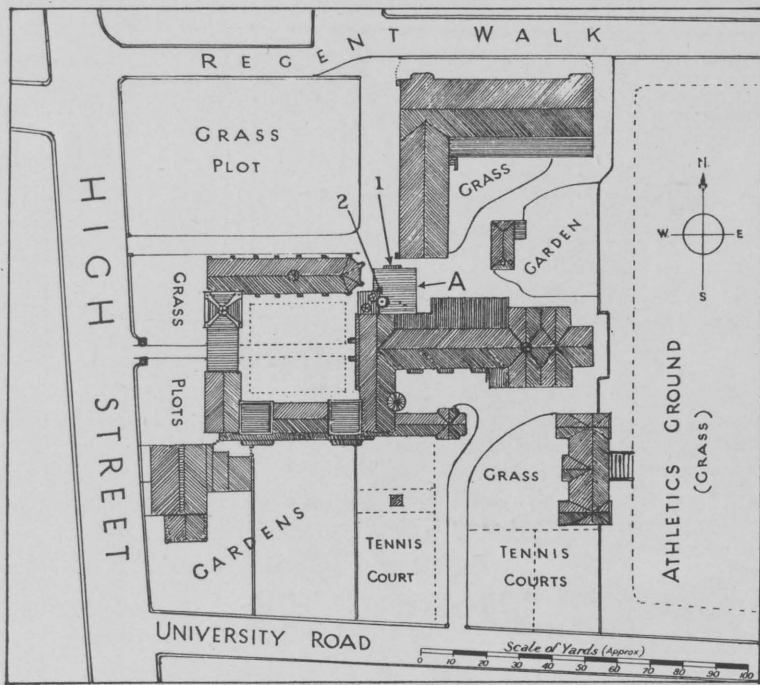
PLAN SHOWING SURROUNDINGS OF OBSERVATORY TOWER, KING'S COLLEGE.
